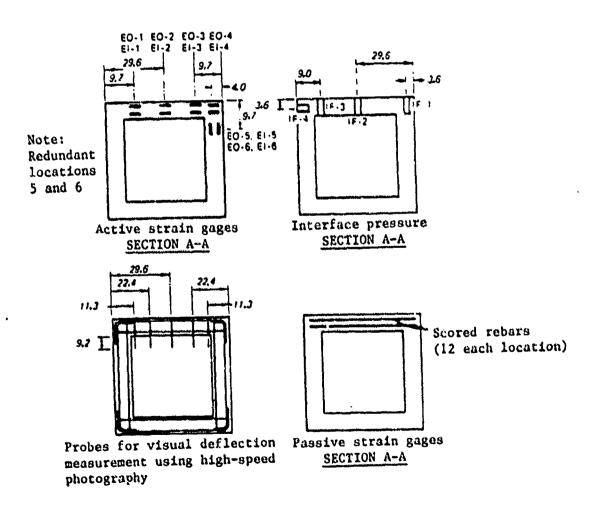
Test instrumentation layout, Test Groups II and III (Ref. 2).
